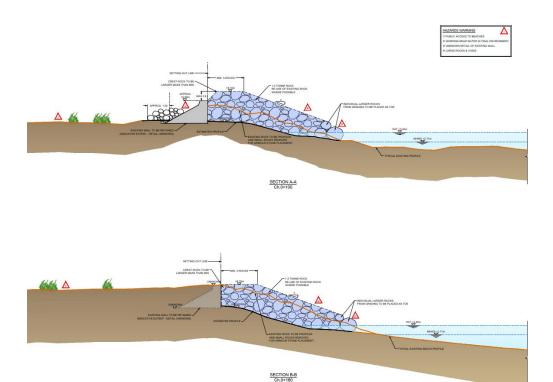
Cross-section of proposed works at Great Popplestone (HR Wallingford, 2022)
